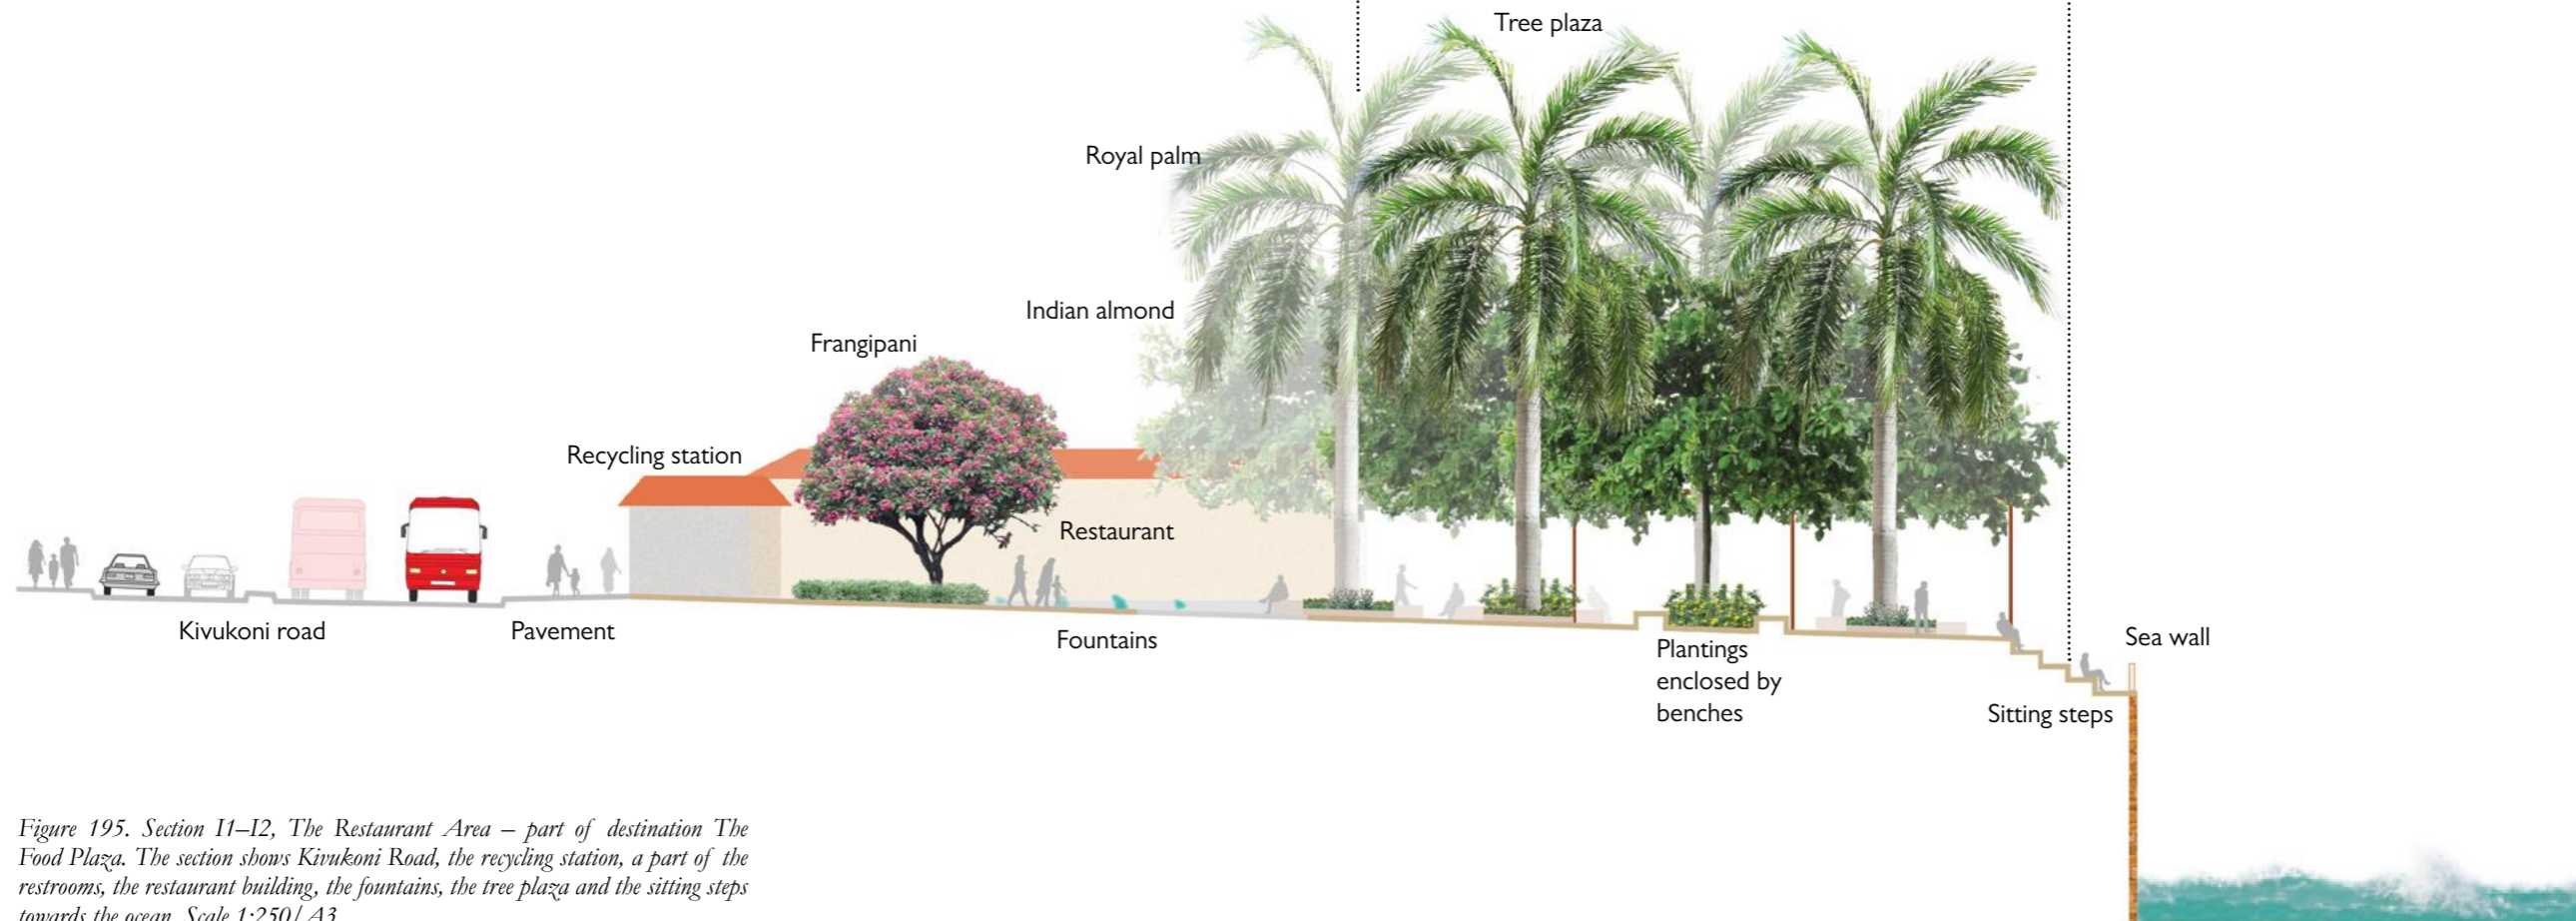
Section I1–I2, The Restaurant Area – part of destination The Food Plaza. The section shows Kivukoni Road, the recycling station, a part of the restrooms, the restaurant building, the fountains, the tree plaza and the sitting steps towards the ocean. Scale 1:250/A3.
